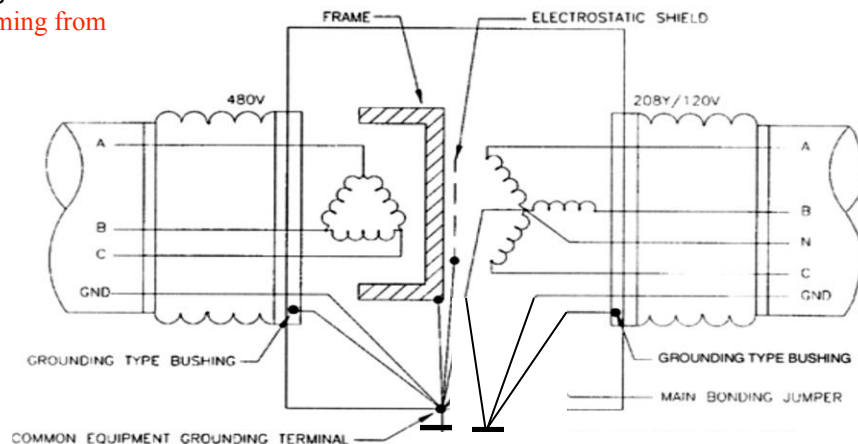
Ground connections for isolation transformer Connecting ground with 'ground-isolation' to the load (Source: qtwork.tudelft.nl/~schouten/linkload/grounding.pdf)
